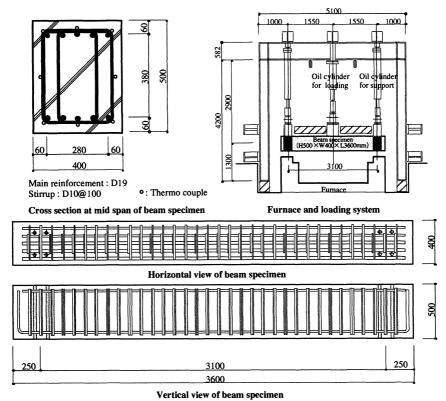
Cross section of beam specimen and test apparatus (unit: mm)
